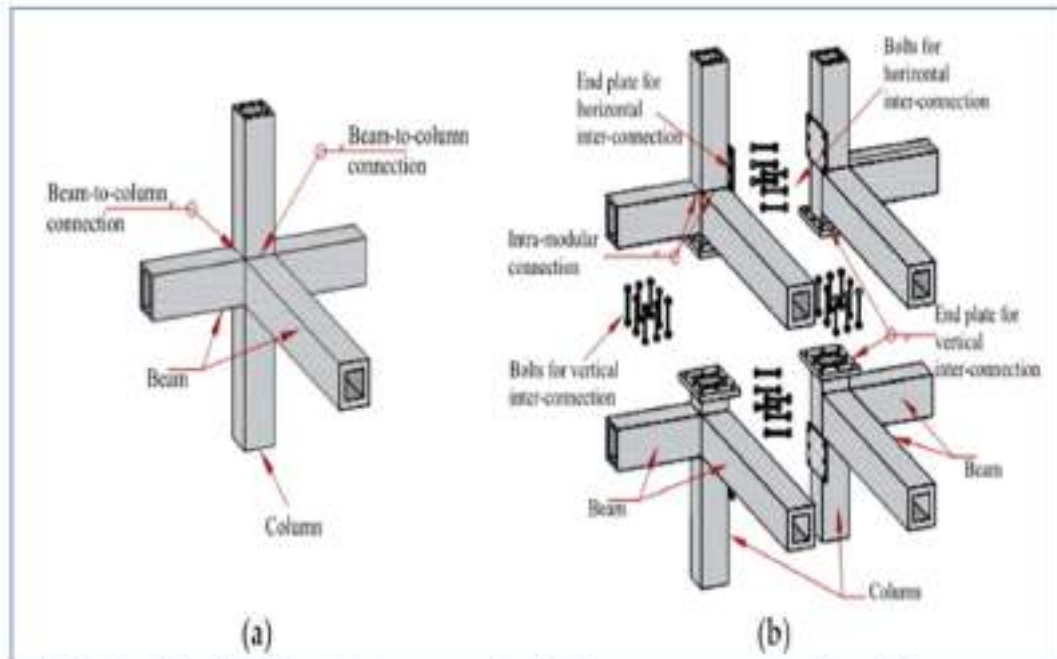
Details of a joint in (a) conventional (b) corner-supported modular structures [39]
